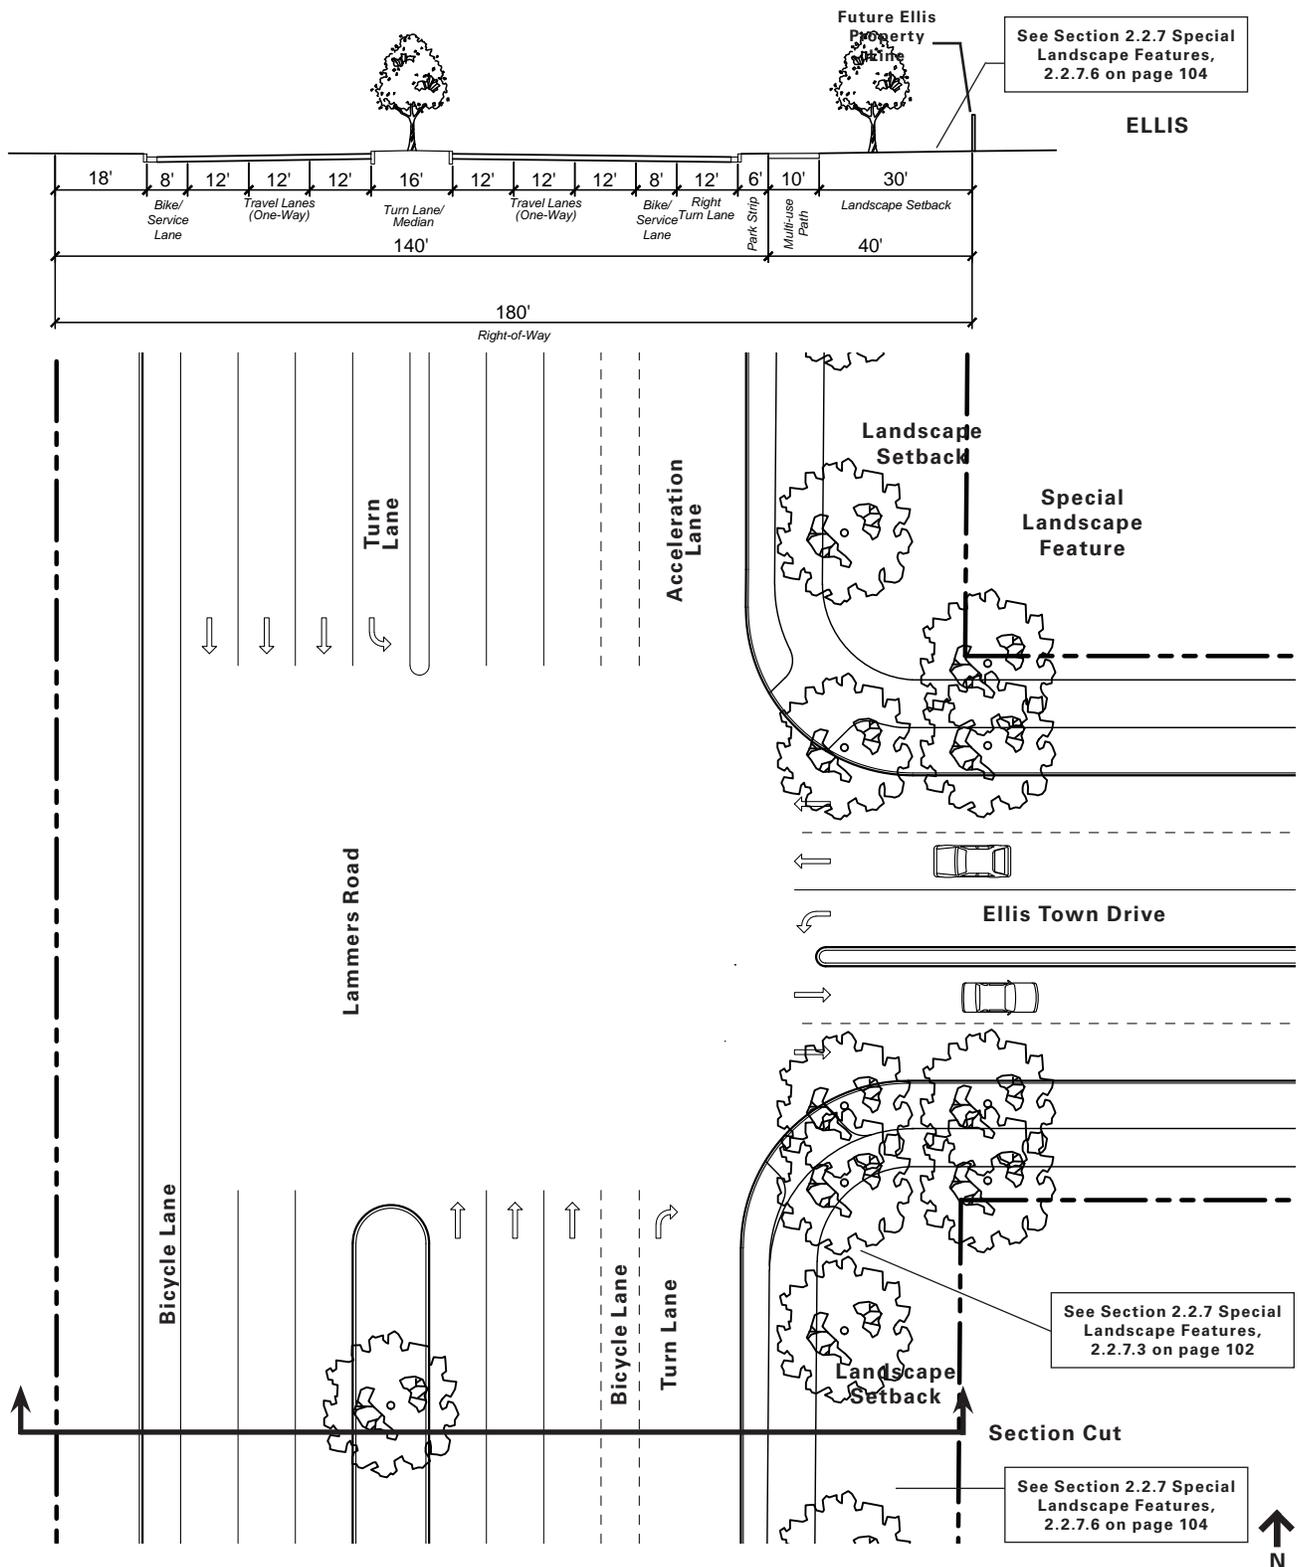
Build-out Section and Plan: Regional Arterial – Lammers Road, Designation A (Final Build-out)
